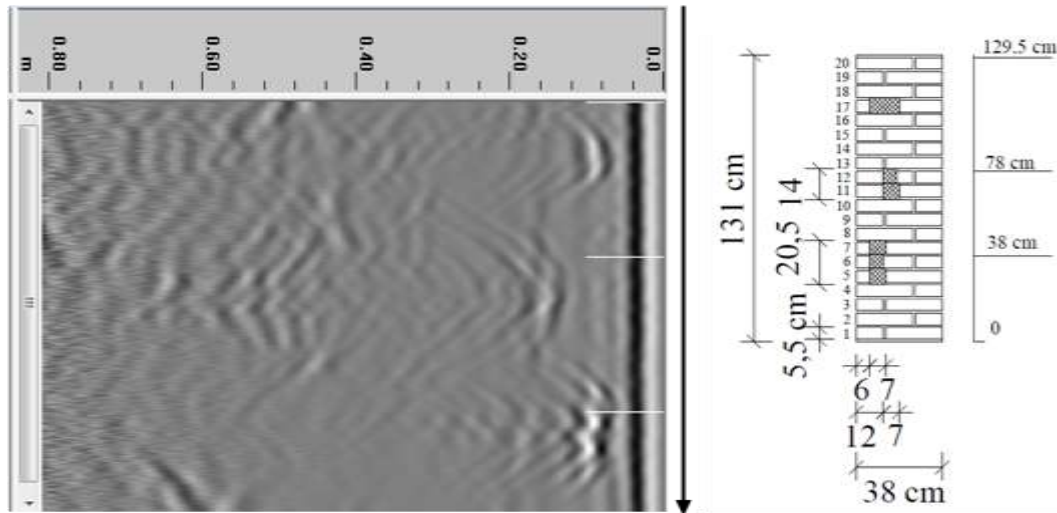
Post-Processed radargram on vertical line (F007) (left) ; Vertical section wall PNDE (F007) (right)
